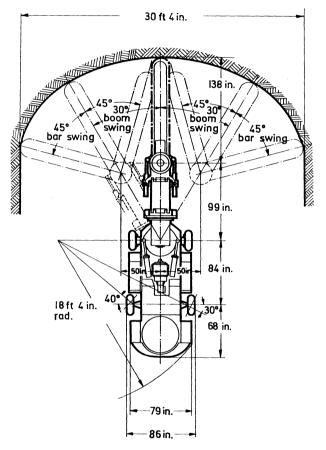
Arc-wall cutter. (Joy Manufacturing Co.)
